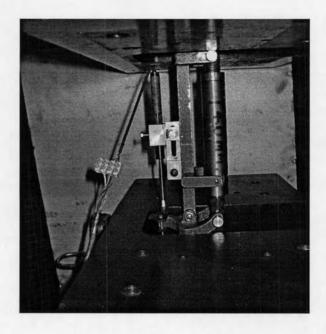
Displacement transducer installed at the deformometer to measure the slip between the coupler and thread bars
